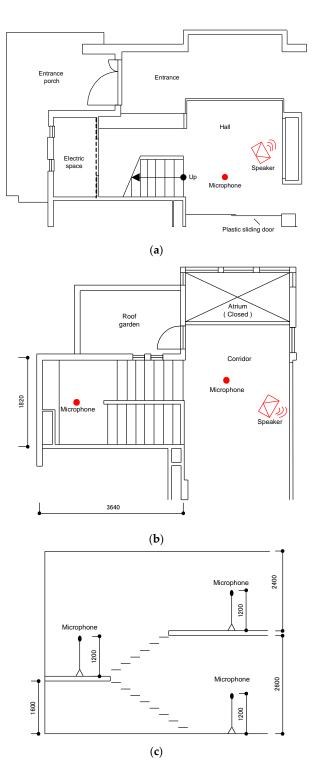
Plan of the stairwell used in the experiment. (a) First floor plan, sound source position and measurement position; (b) Second floor plan, sound source position and measurement position. (c) Sectional view of stairwell and microphone height.
